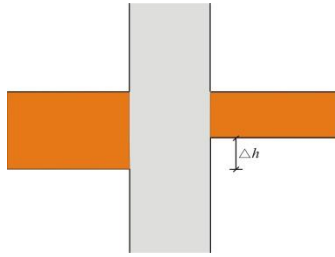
Eccentric reinforced concrete beam-column joint with different beam depths
